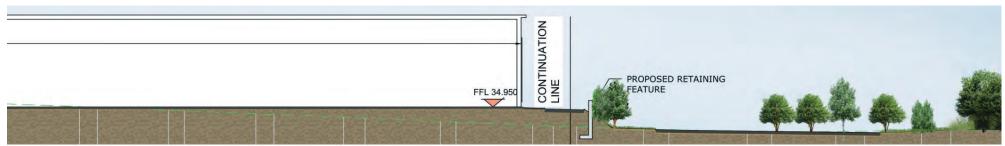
Section through proposed building, retaining feature and car park (NW to SE)
